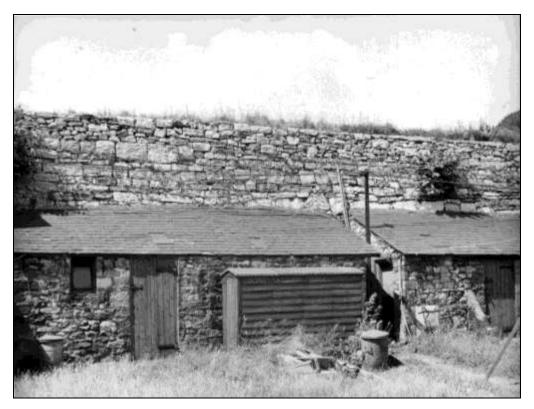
Historical photograph showing former lean-to outbuildings against the retaining wall.
